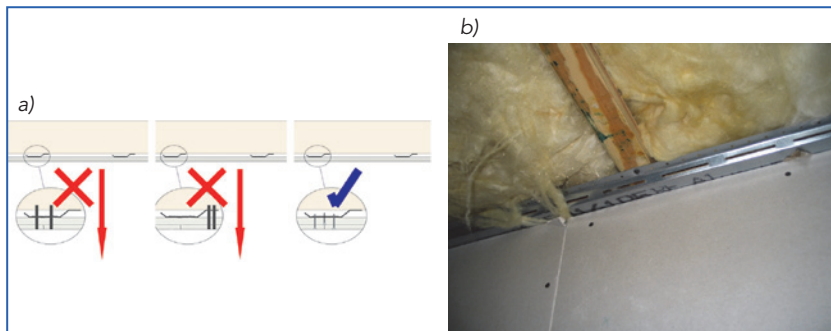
a) Example of correct and incorrect fixing plasterboard to resilient bars. Ceiling fixing screws should only penetrate resilient bar and not touch joists. b) Bypassing of resilient bar or placing wall linings hard against resilient bars will reduce their effectiveness.
